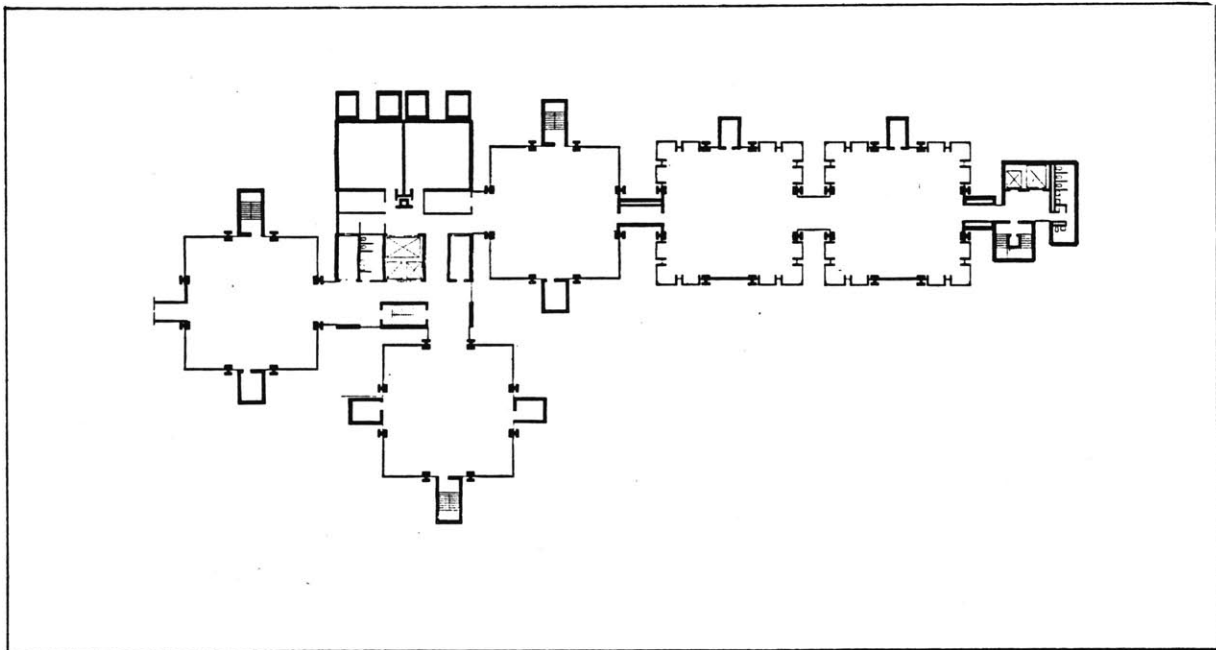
Second floor plan of Richards Labs and Biology Building.
